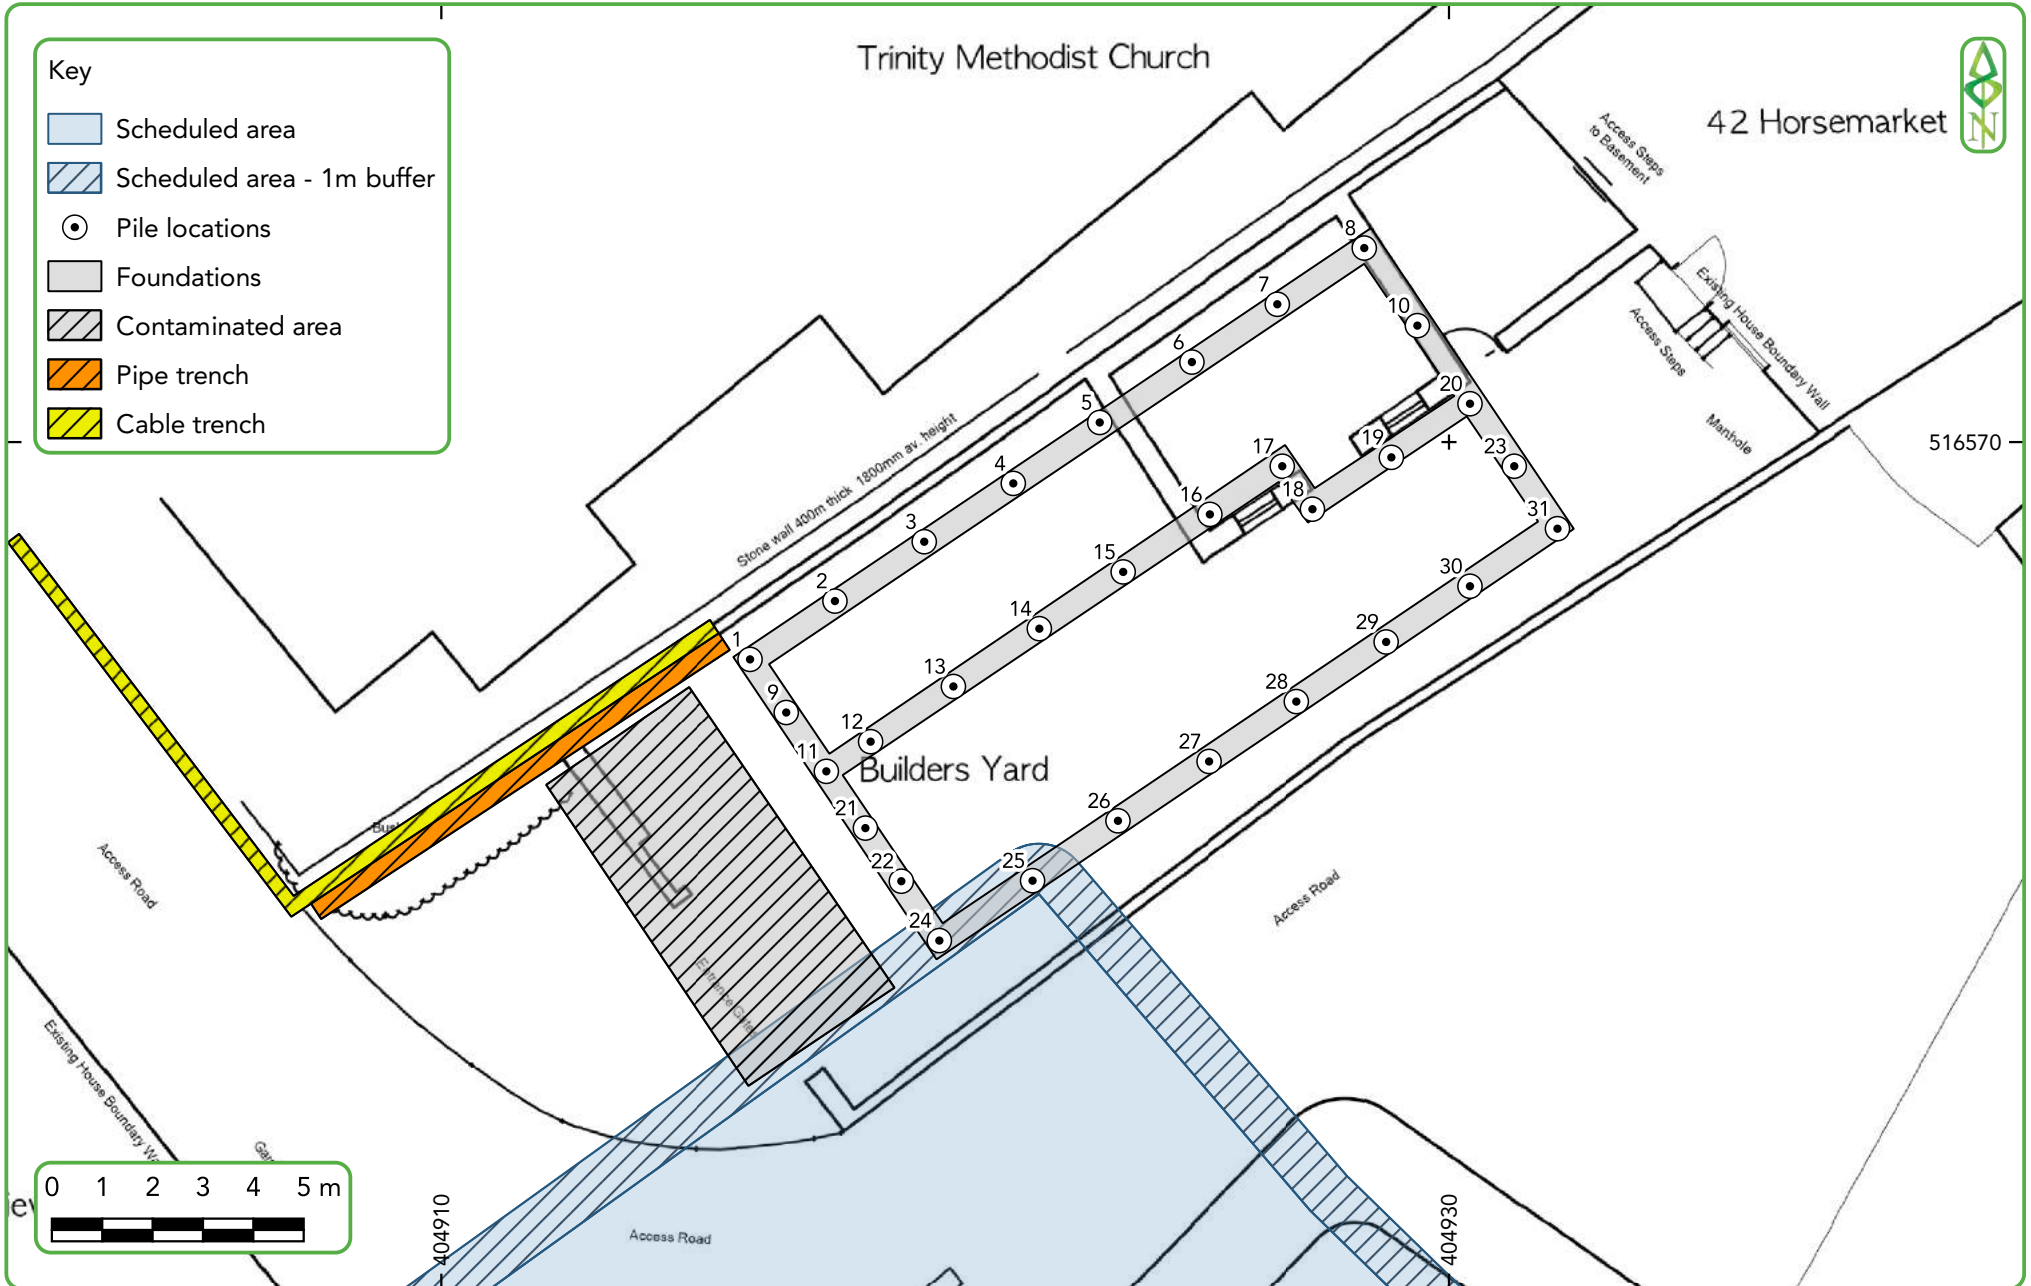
42 Horsemarket: Existing plan showing proposed foundations and pile layout
